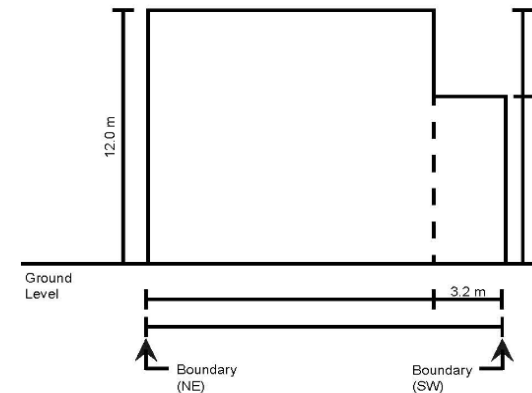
Figure II: Interpretative Diagram for site standard 10.6.5.1(i) to demonstrate the 8m and 12m height limits.
